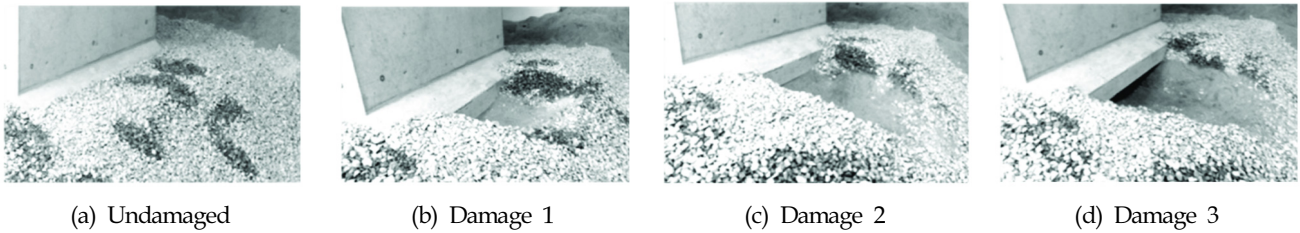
Inflicted damages in foundation-structure interface of lab-scaled caisson
